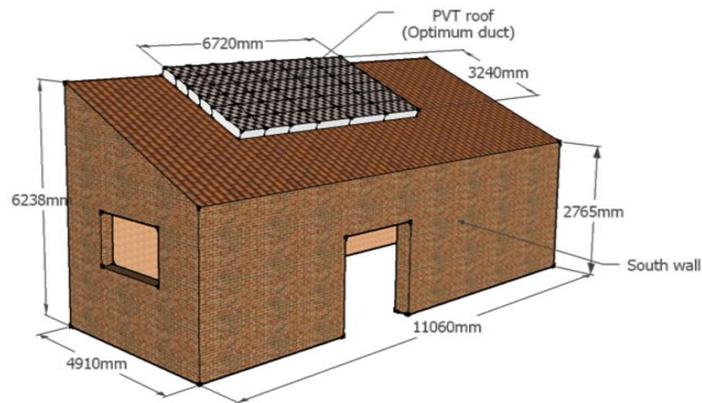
Perspective view of proposed building integrated photovoltaic thermal (BIPVT) system installed at the roof of the building
